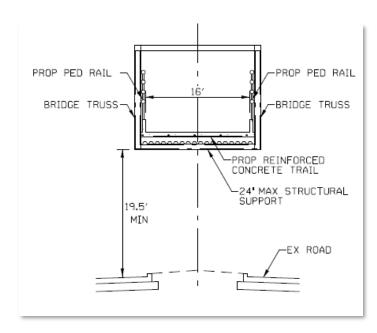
Proposed Pedestrian Bridge Overpass Typical Section
